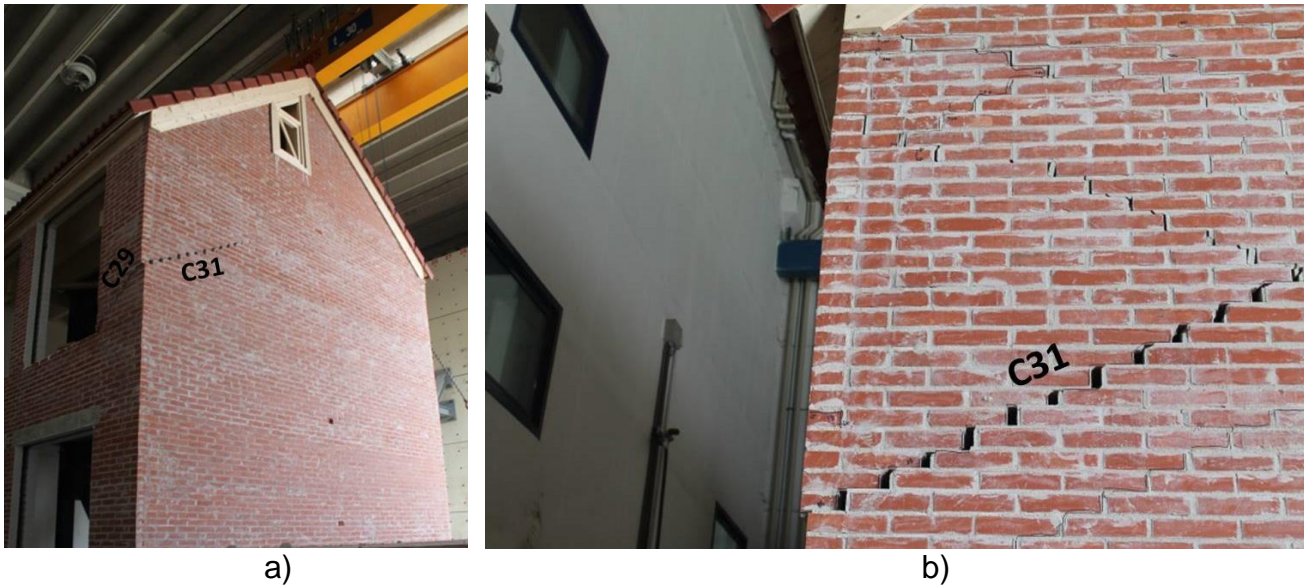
EQ-NPR IS 133% cracks: a) C29 and C31 overview; b) C31 zoom in.
